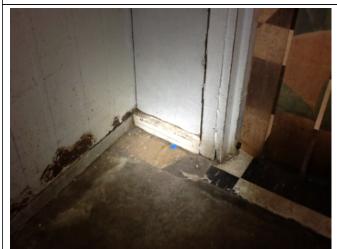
NT0554-320 Result: Asbestos - Positive Building/Level: Main Building - Supermarket-Ground Level Room/Location: Storage Room-Adjacent to store entry door Feature/Material: Floor Covering Adhesive-Vinyl Tiles & Adhesive
